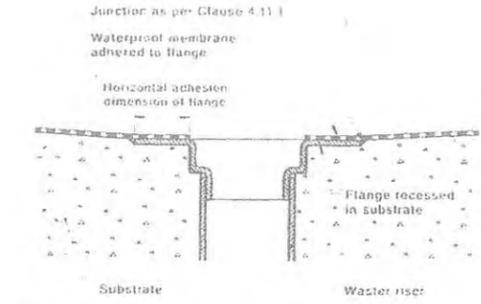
(A) - Typical membrane termination at leak control flange
